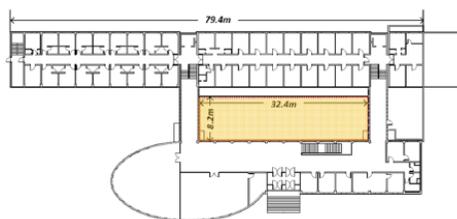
Ground plan (1st floor) of the accommodation (Unit: m)
